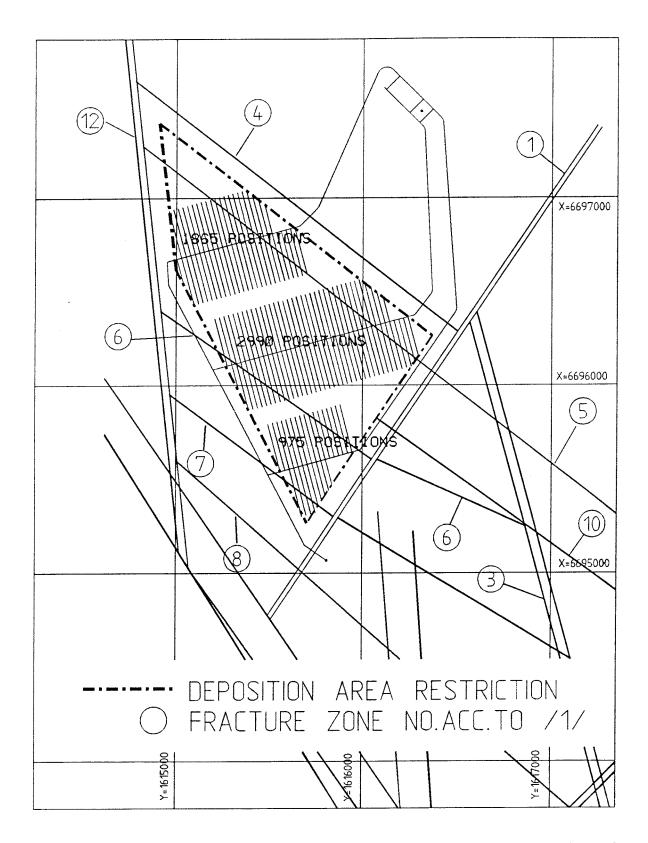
Repository layout with north/south orientation of deposition drifts. Level -600 m.
